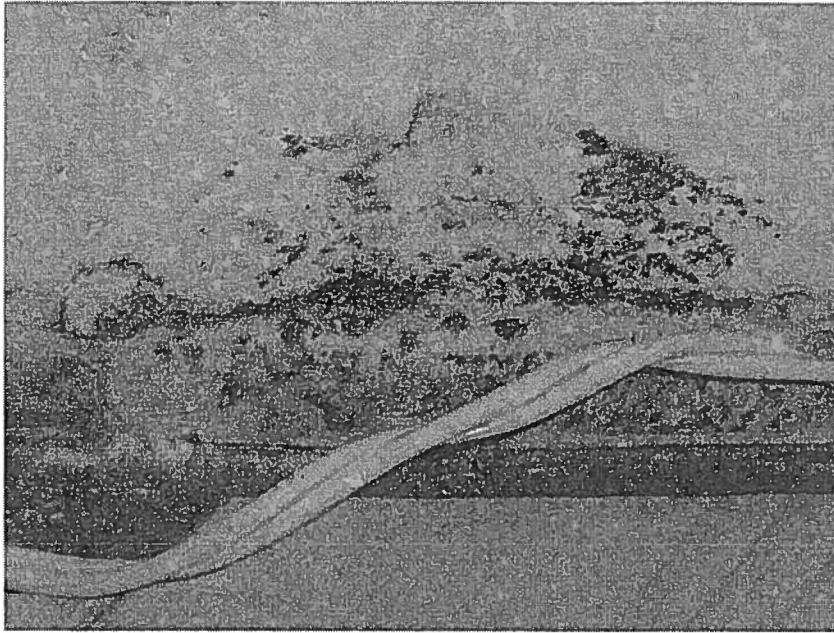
Suite 1201: Black mould like staining on interior drywall below a window.
